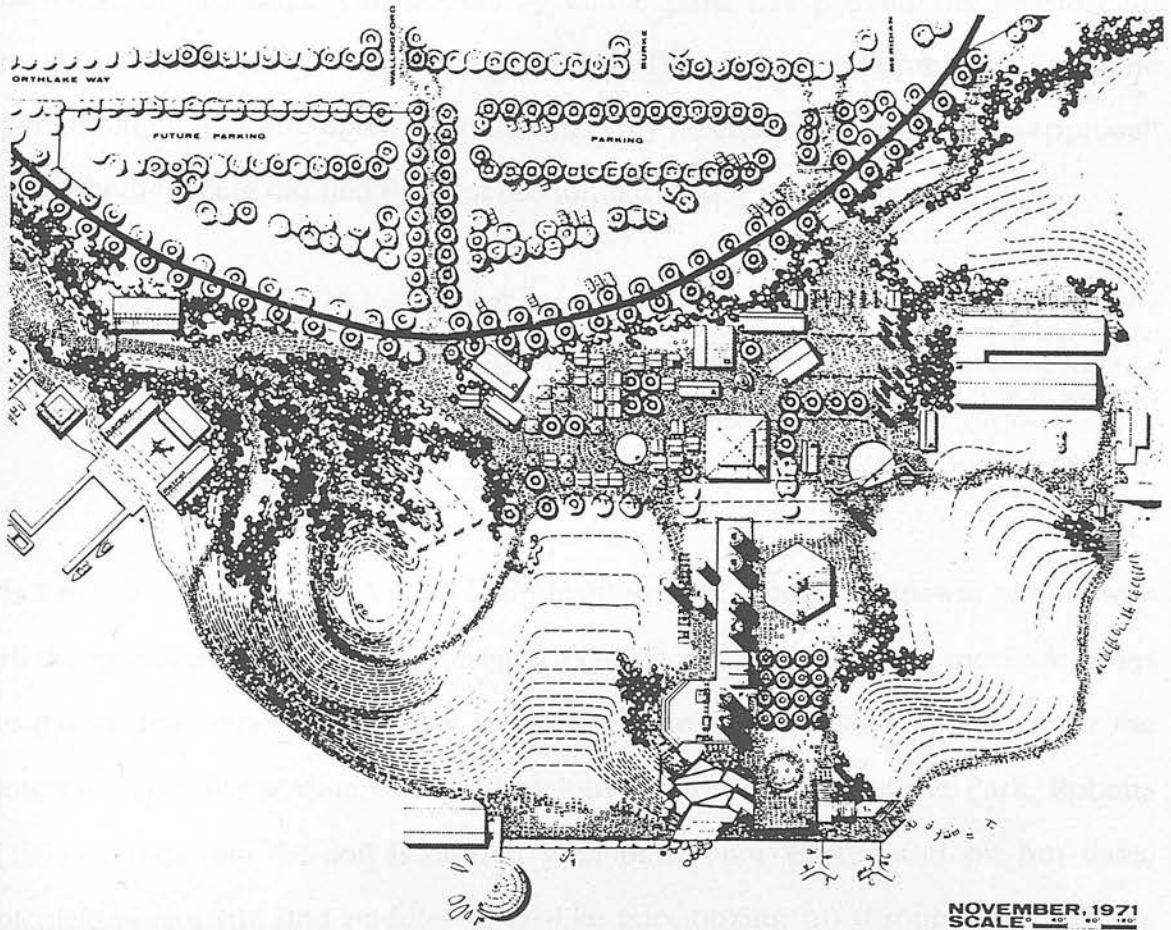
Plan, Gas Works Park, Seattle, Washington, Richard Haag, landscape architect
